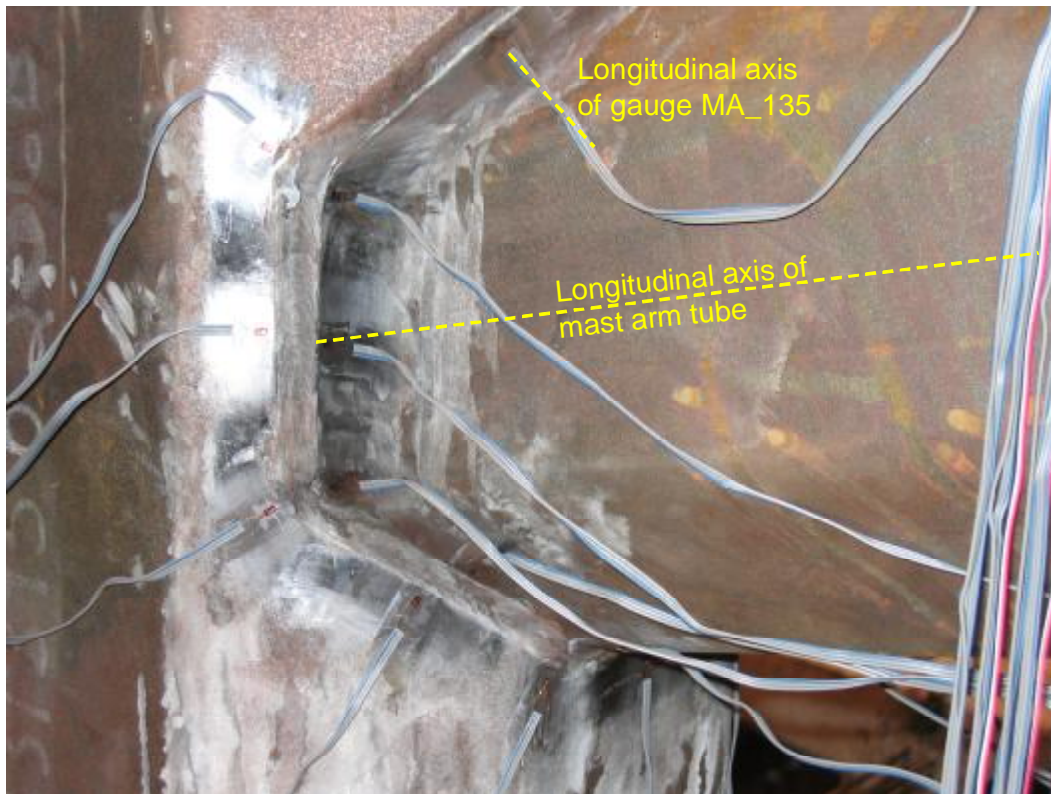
View of Type II mast arm showing how strain gauges are orientated perpendicular to weld toe.
